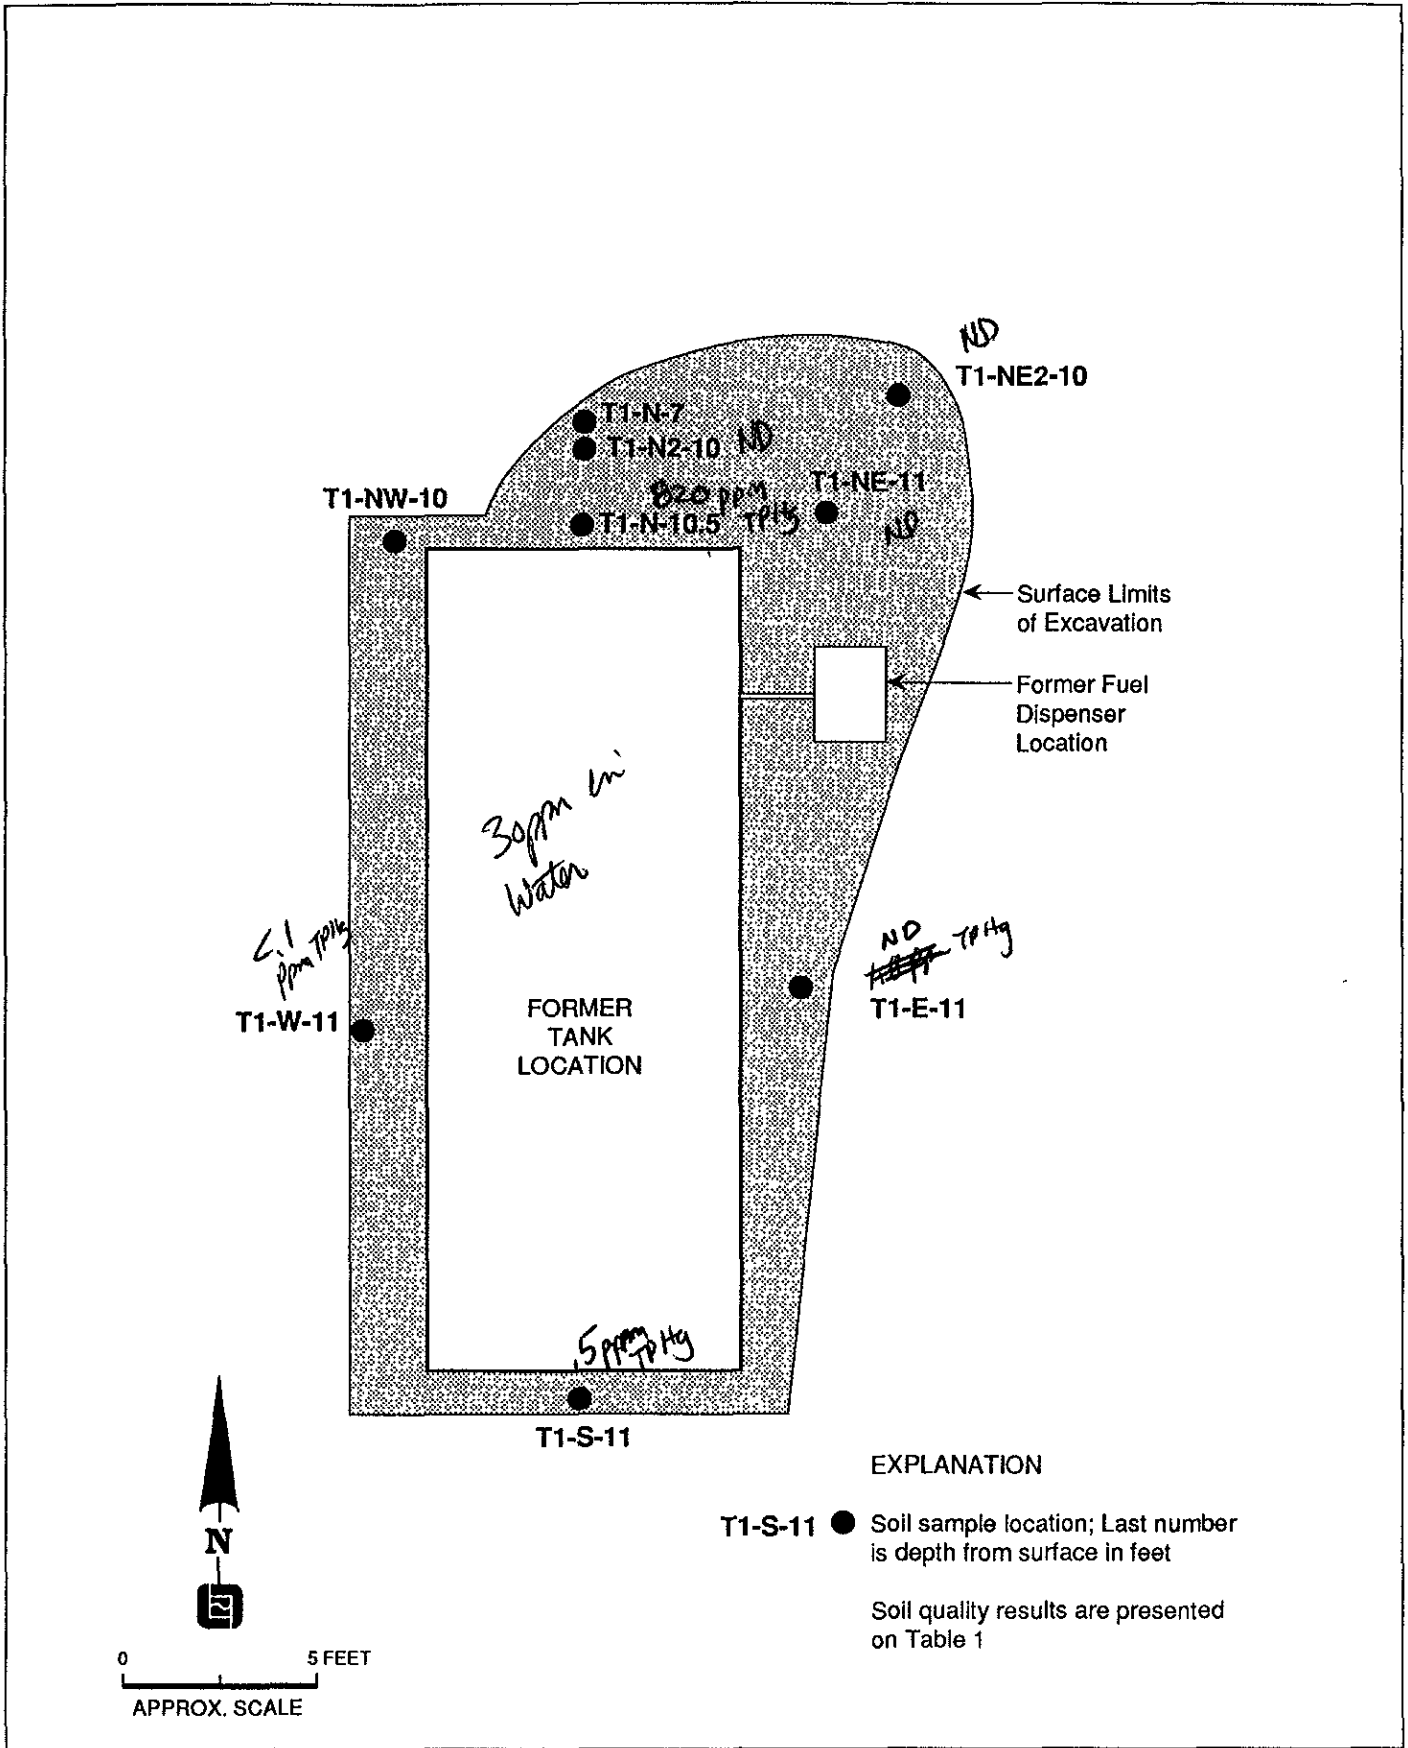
PLAN SHOWING SOIL SAMPLE LOCATIONS
